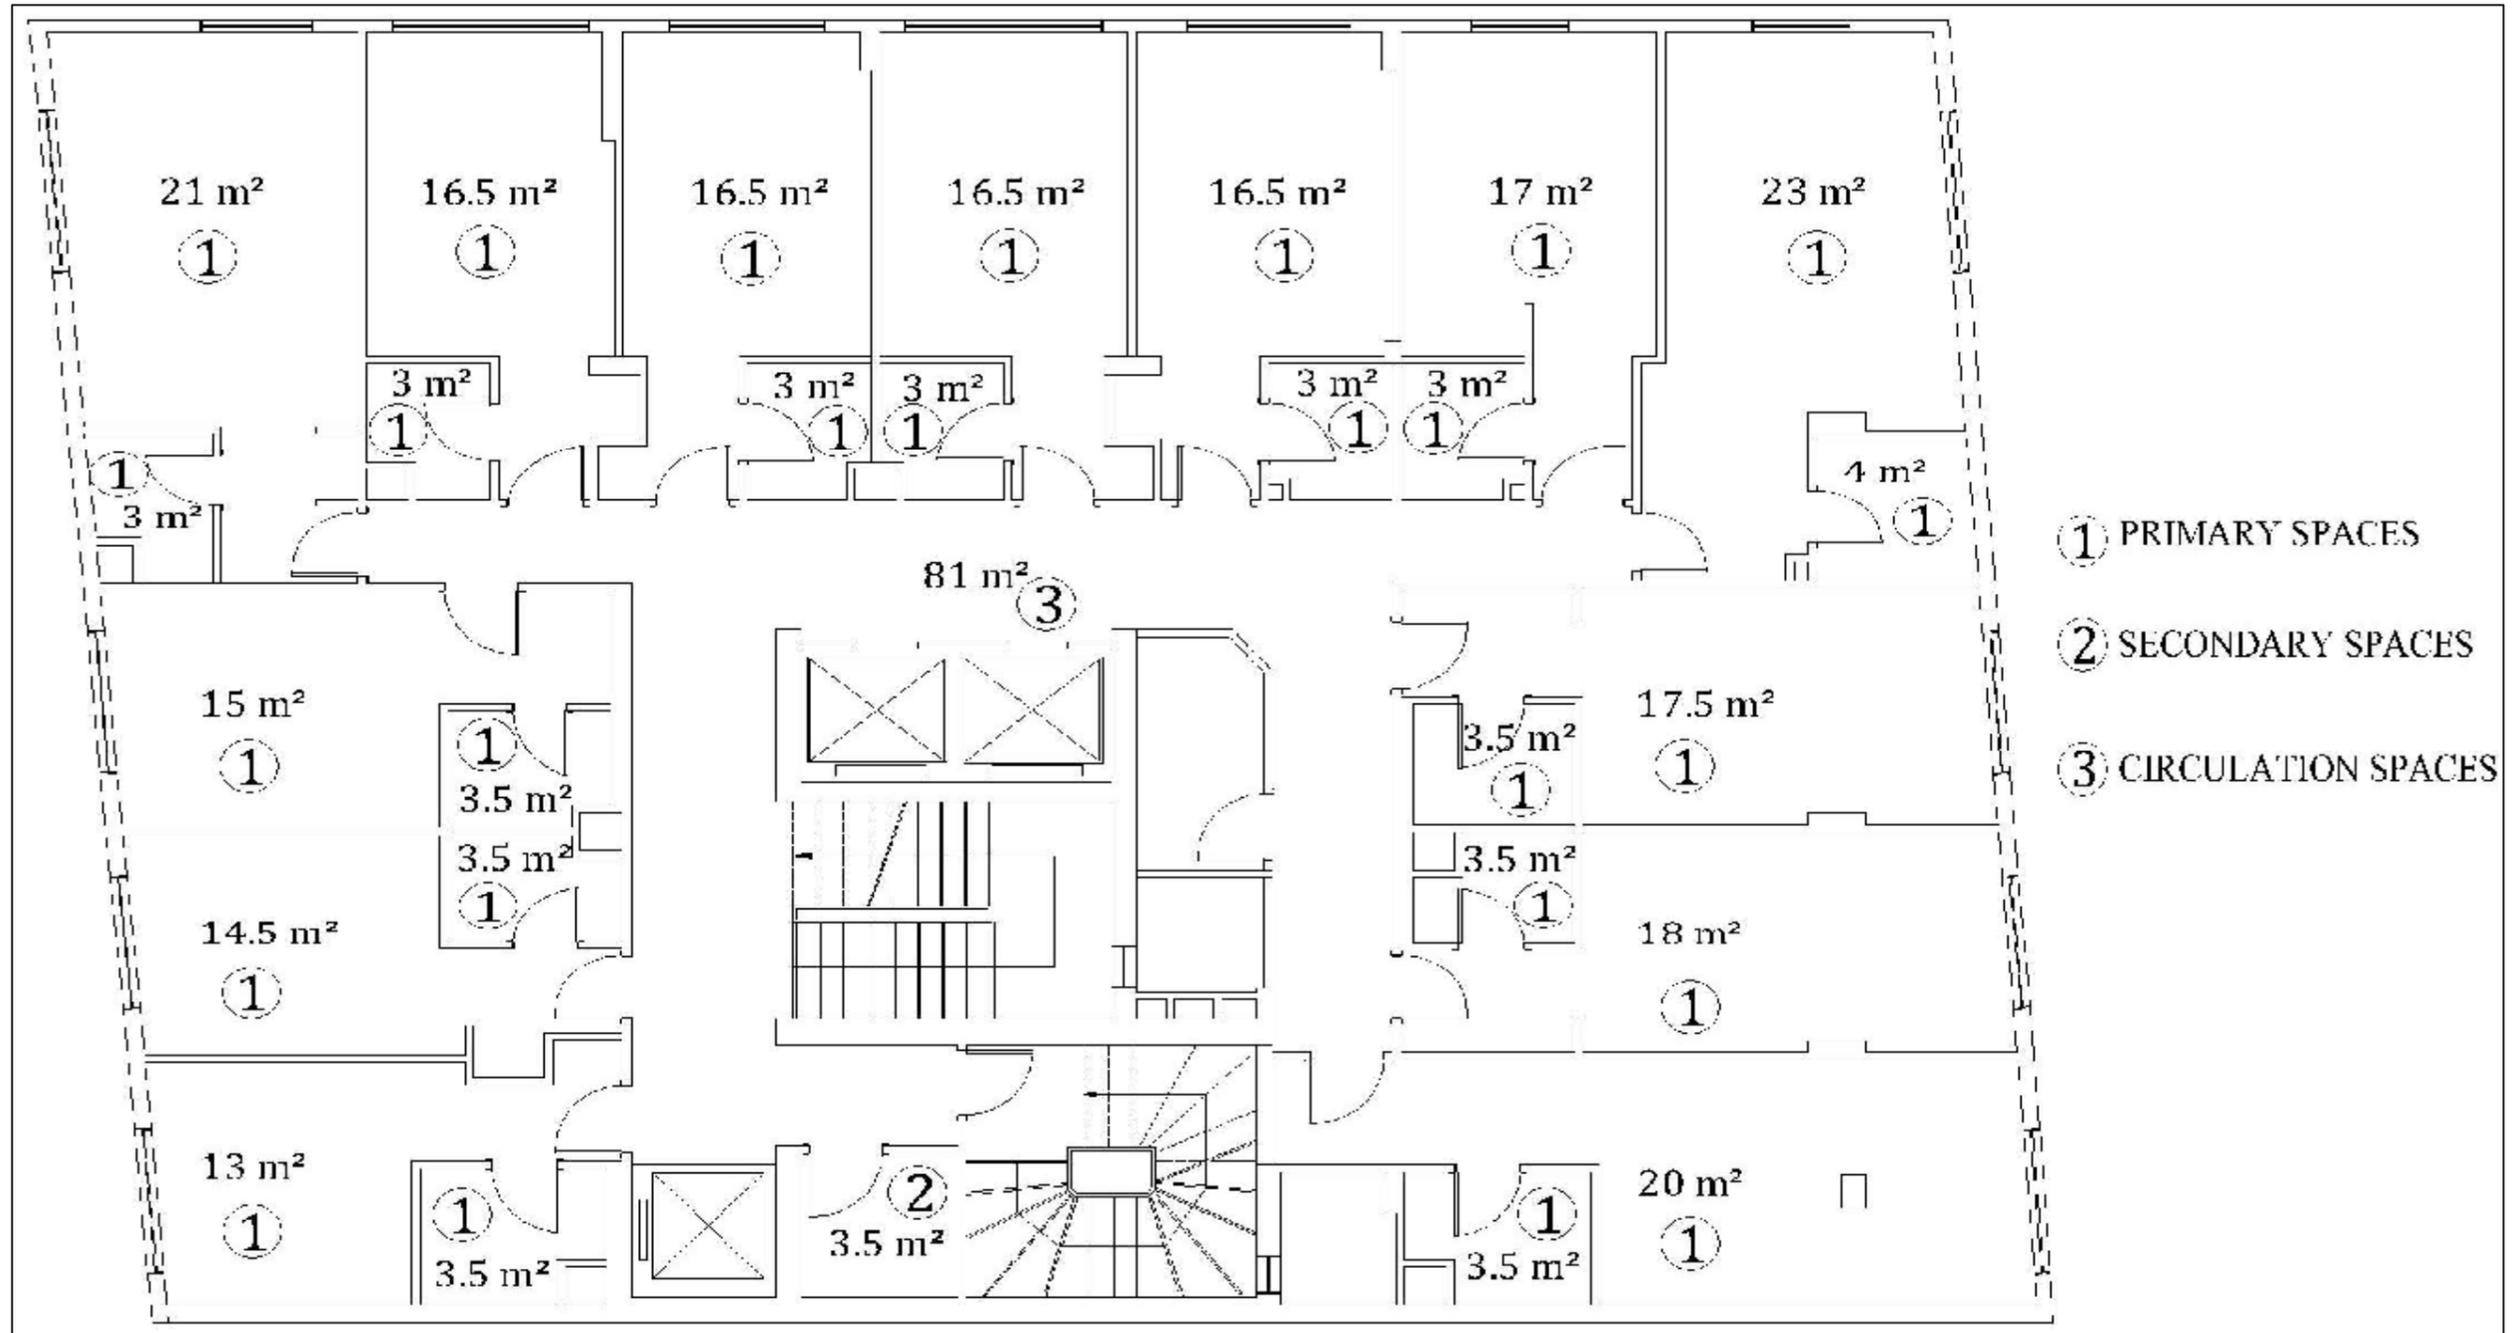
Floor plan of Sample 04 (S04) displaying, primary, secondary and circulation spaces.
